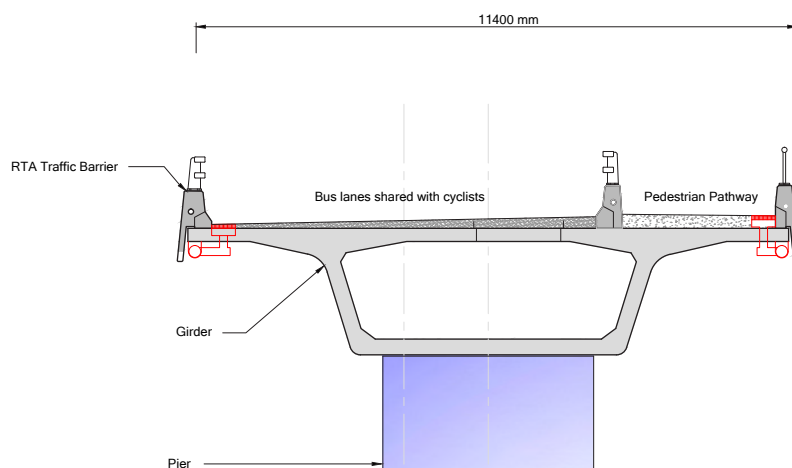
Option 3: Conventional concrete box girder bridge
